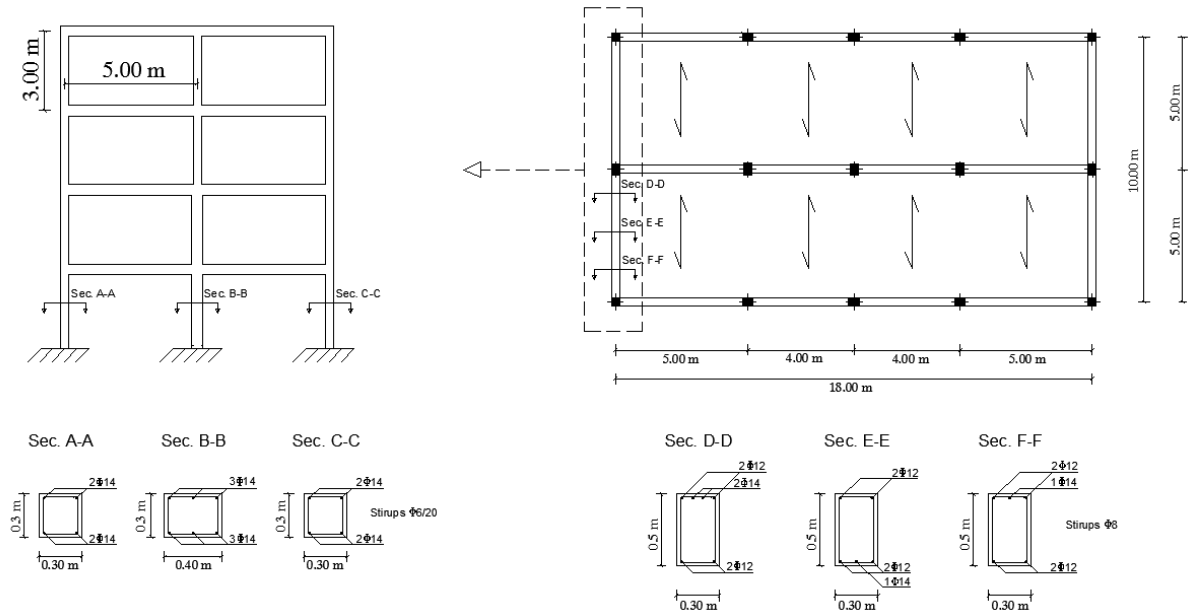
Building plan and elevation of perimeter frame for the 4 storey GLD building.
